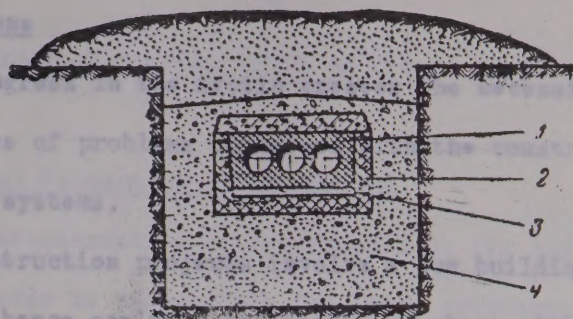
Combined Installation of Heating and Water Mains in a Buried Prefabricated Reinforced Concrete Conduit Showing the Conduit and the Manner in Which it is Placed in the Soil:
